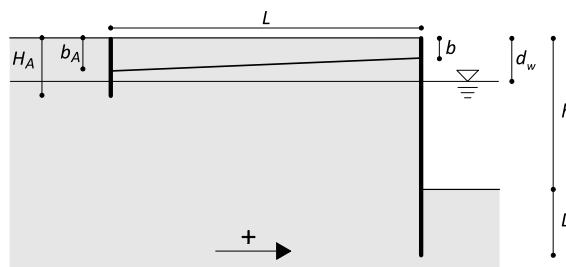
Typical layout of an anchored SSP wall and sign convention on positive acceleration and displacement.
